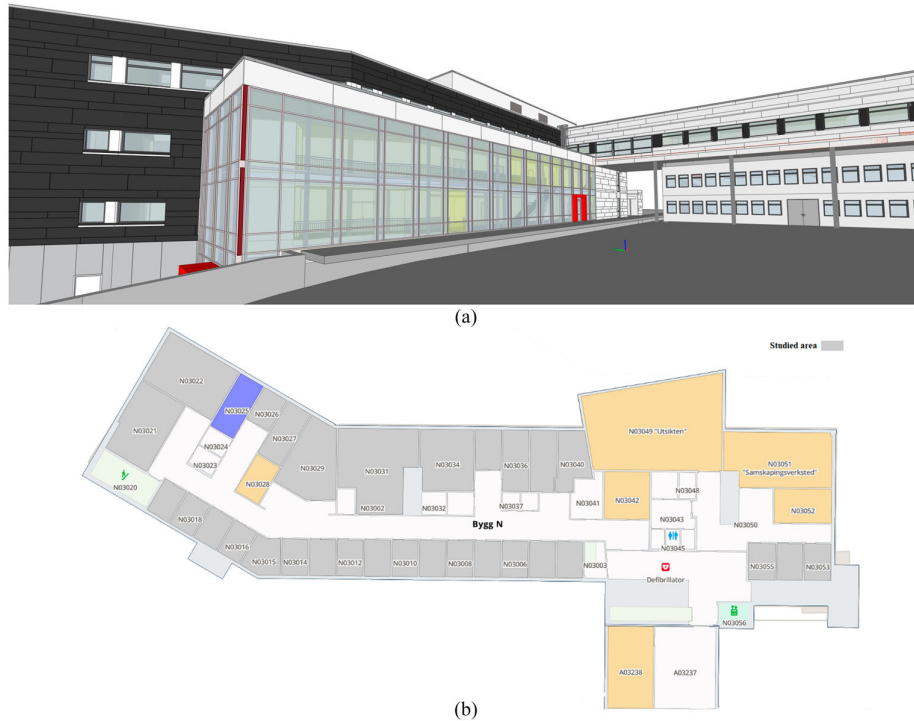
BIM model of I4Helse building that located in Grimstad, Norway (a), and the plan of zones at third floor in I4Hhelse building (b).
